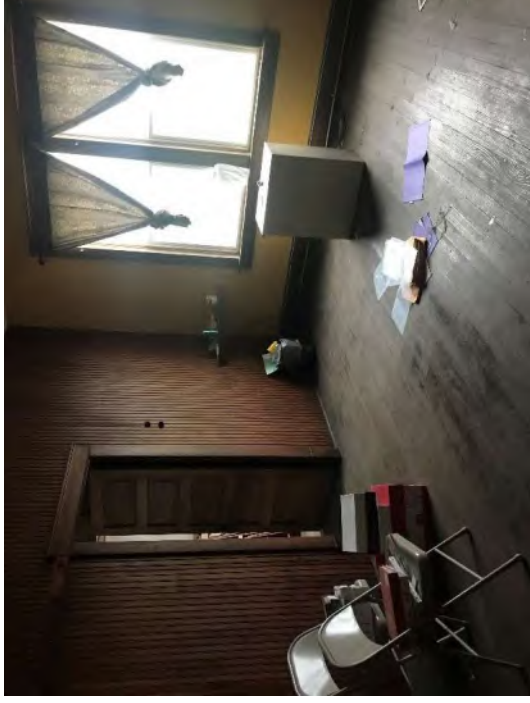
View of a room located in the northern portion of the second floor of the Midland Feed Store building.
